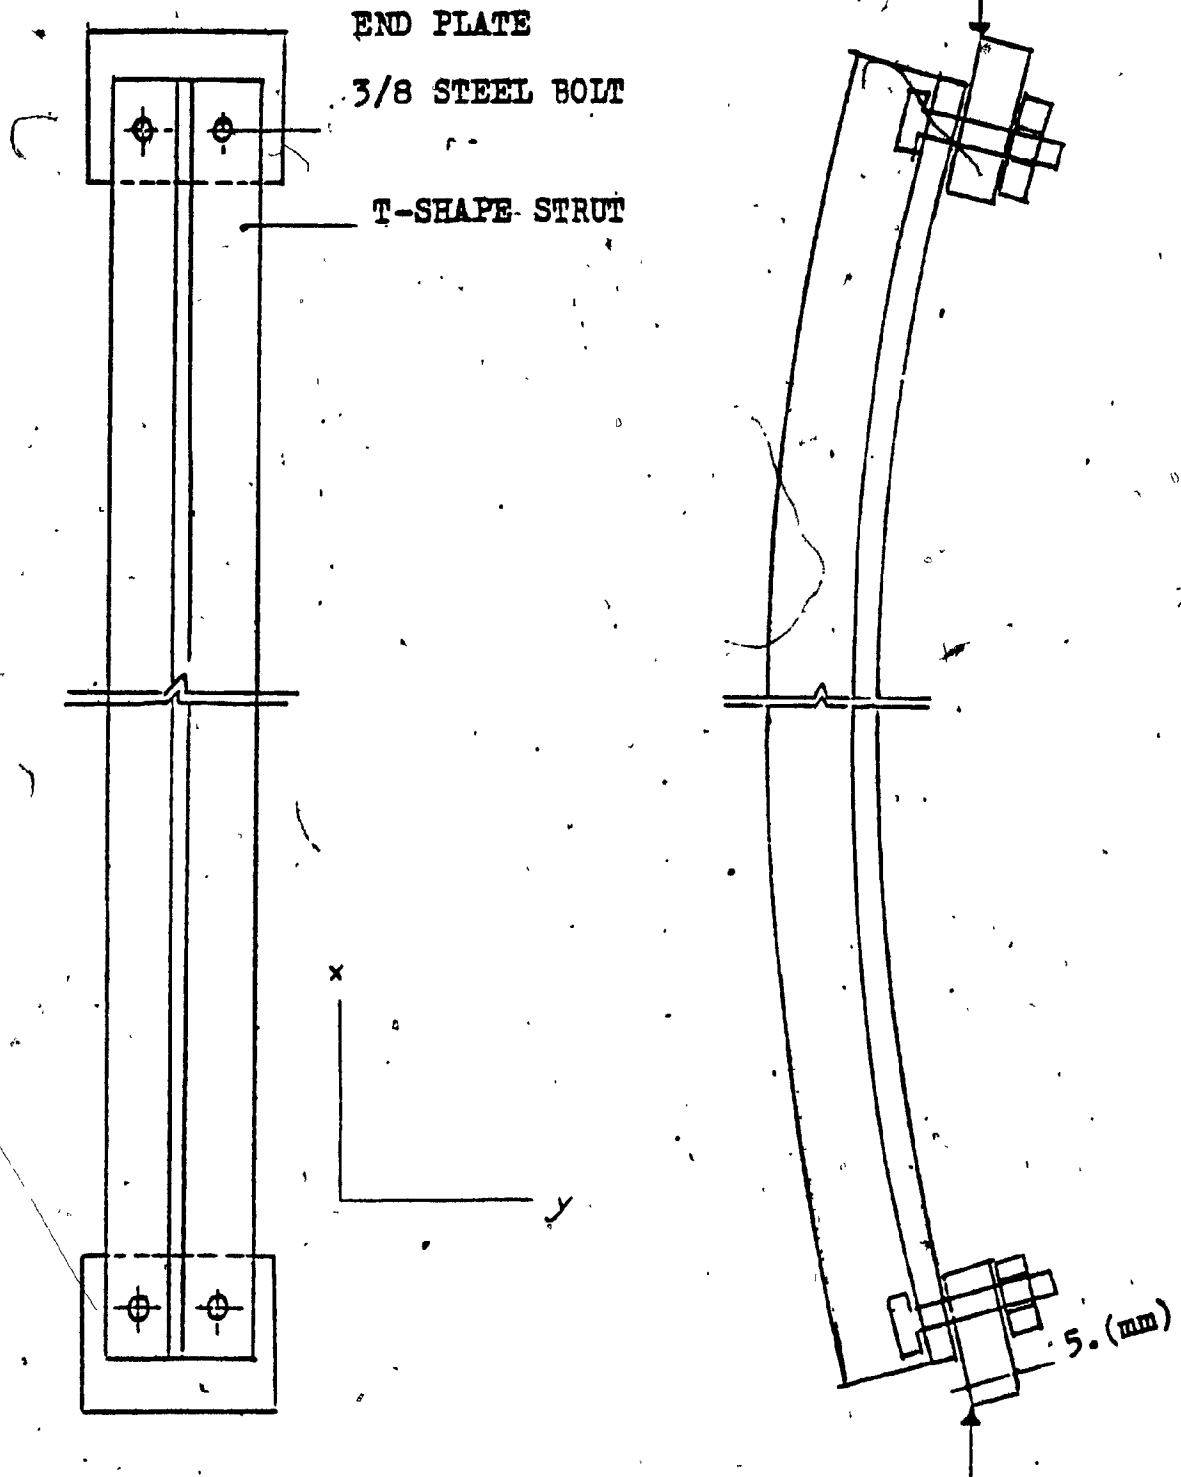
LOCATION OF THE END PLATES AND BOLTS ON STRUTS
